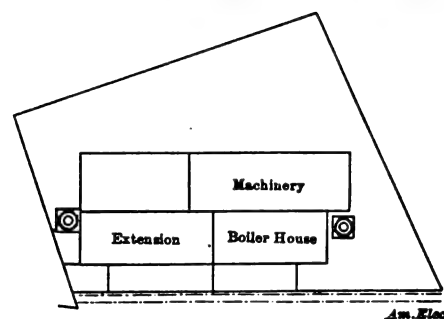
GROUND PLAN OF STATION BUILDINGS.
